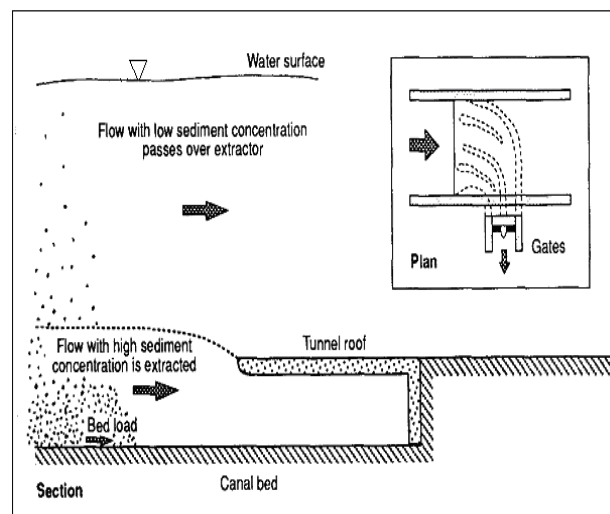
Sectional Elevation and Plan of a Tunnel type Silt Ejector
